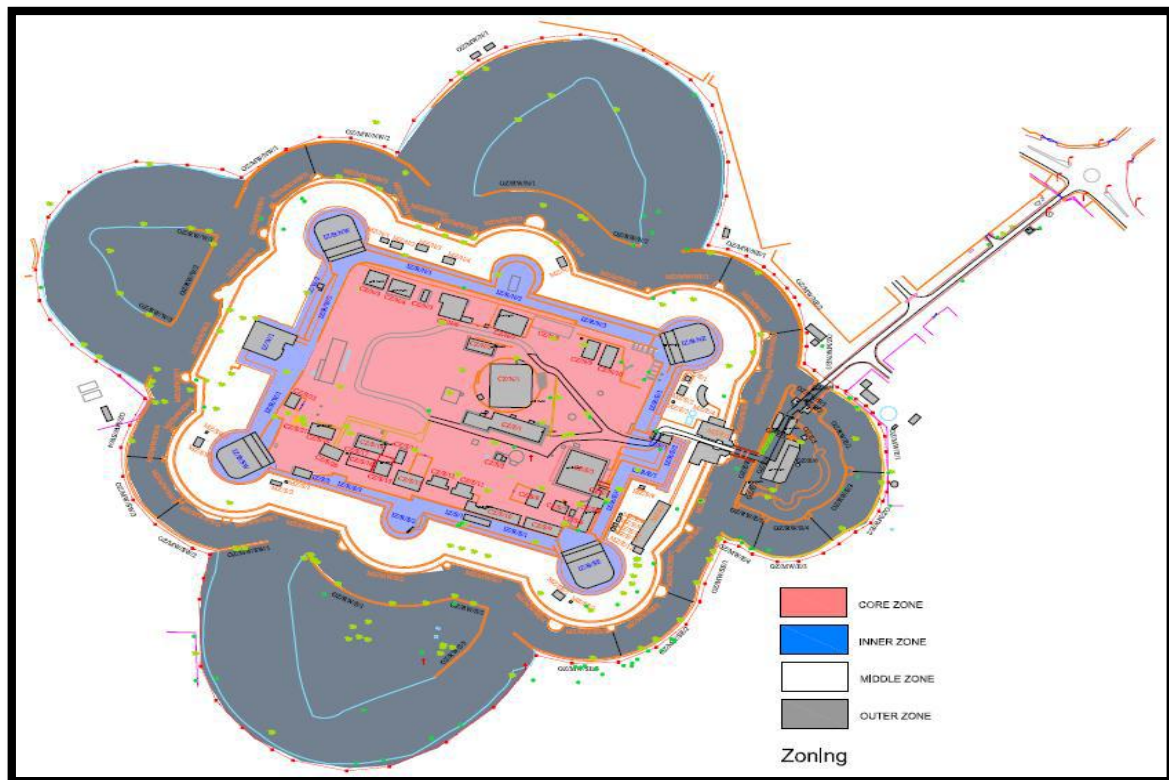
Zonal Plan and Defensive Layout of Gobindgarh Fort, Amritsar, illustrating the spatial organization of the fort into core, inner, middle, and outer defensive zones. The plan highlights the strategic arrangement of bastions, gateways, defensive perimeters, and internal structures, reflecting the military planning and fortified architectural character of Sikh-period defence systems.
